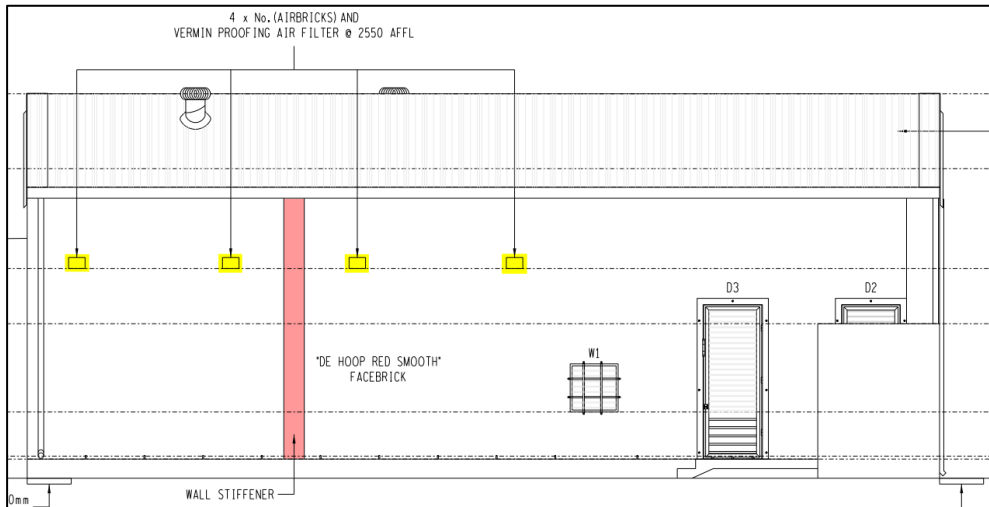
Excerpt from elevations showing airbricks and brick stiffeners
